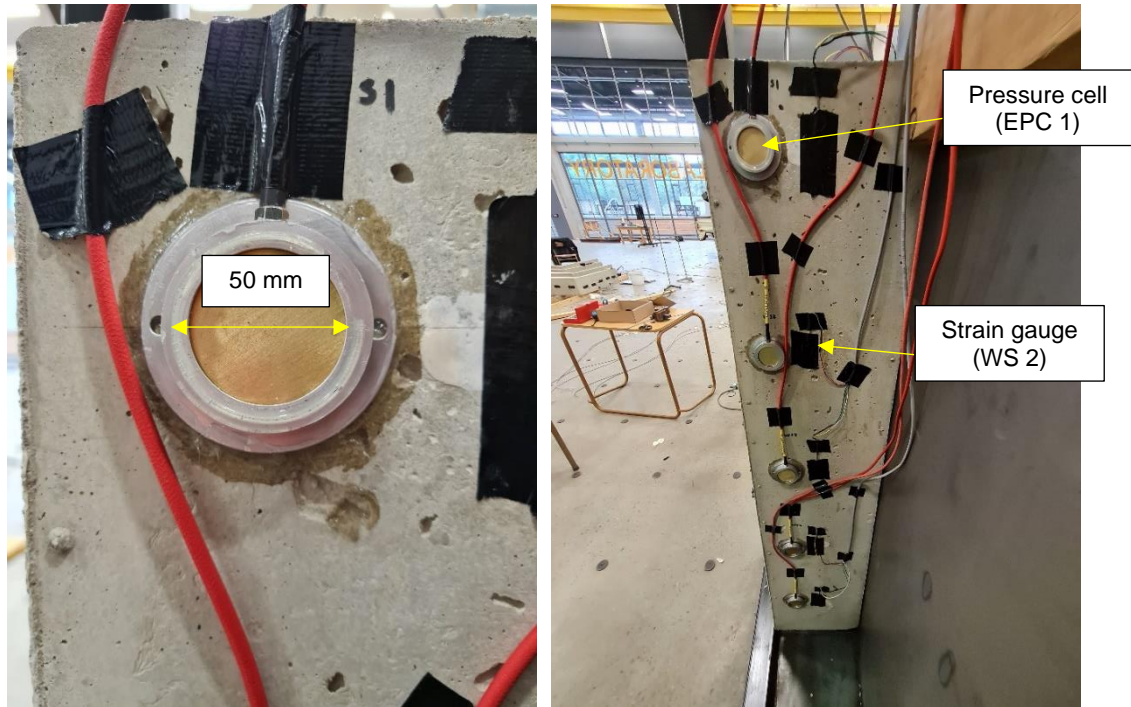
Custom built earth pressure transducers and placement on abutment specimens.
